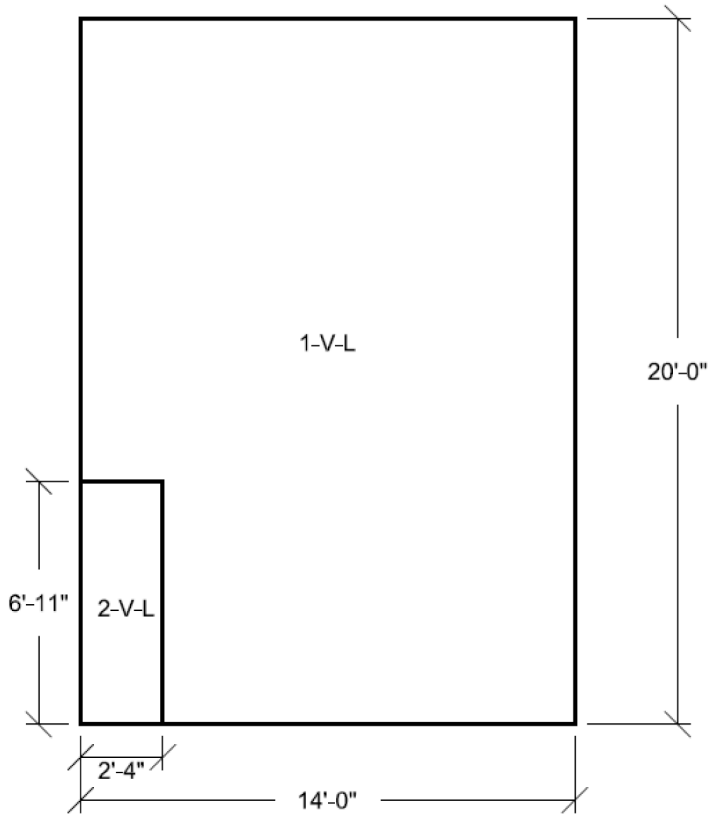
H.6-176A DGFOSV Wall 9 Looking From Outside Vertical Reinforcement Zone Far Side Face
